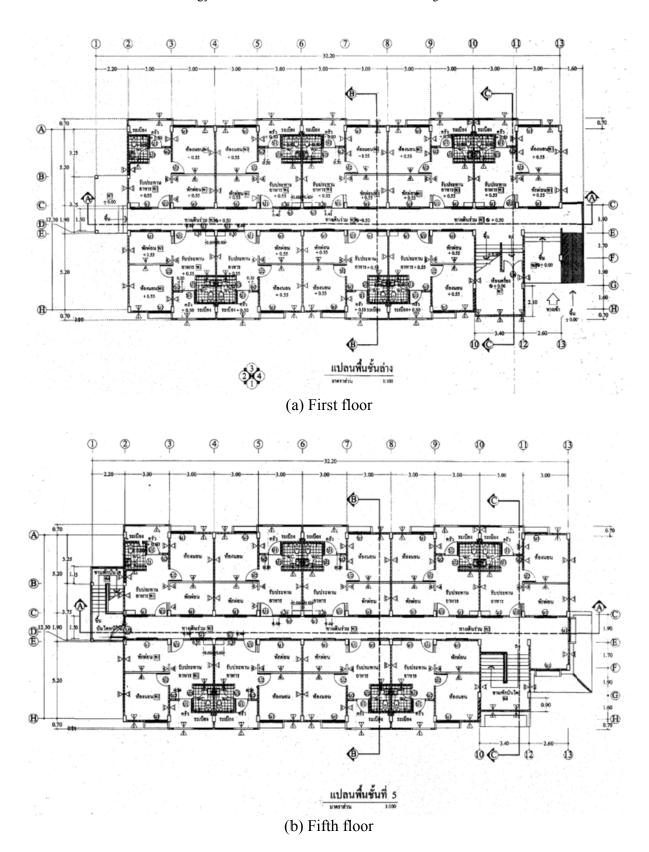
Floor plans of the NHA apartment for low and medium income earners.
